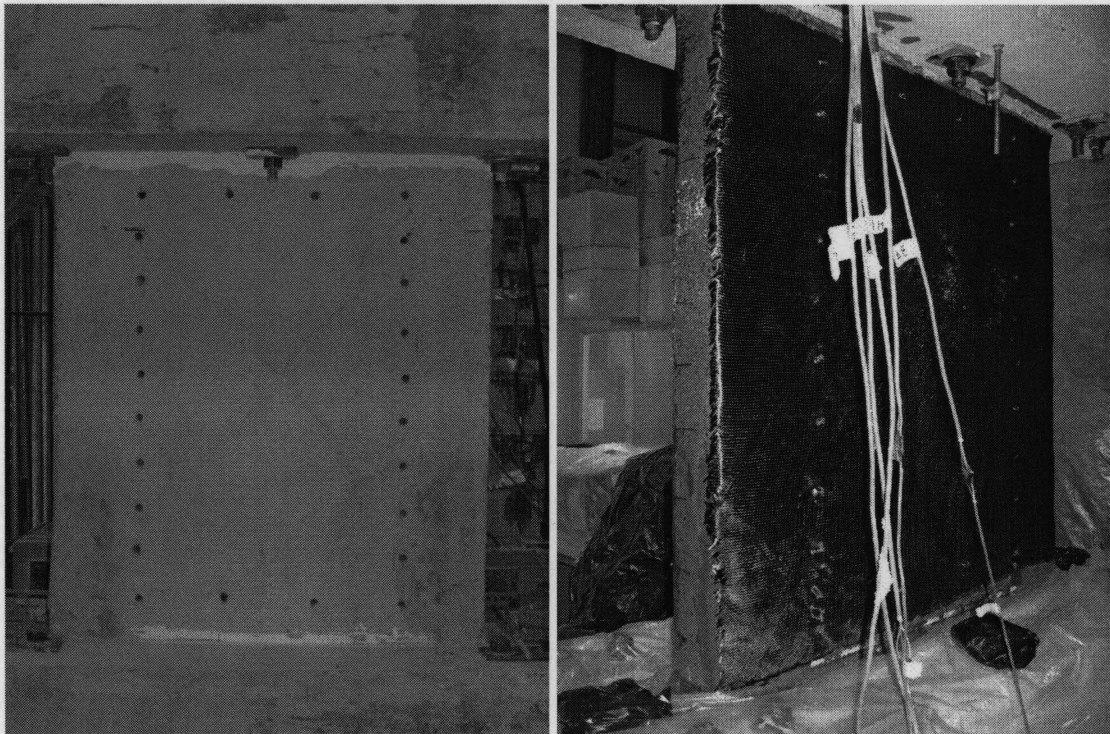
14 Wall RW3 surface grounding and CFRP shear strengthening.
